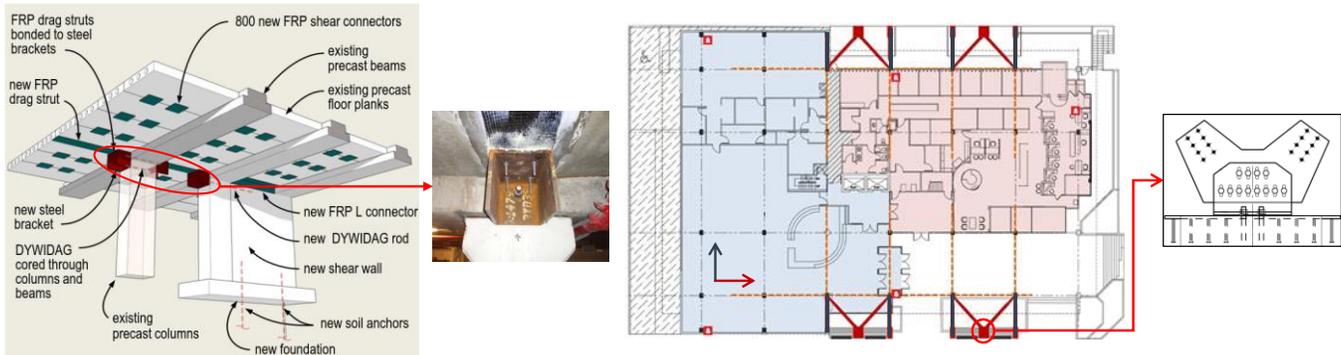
FRP drag strut to steel bracket connection to provide continuity of load path through columns and into the shear walls (left side of figure); layout of drag struts (red dotted lines) relative to BRBs and slotted connection at base of V-configured BRBs.
